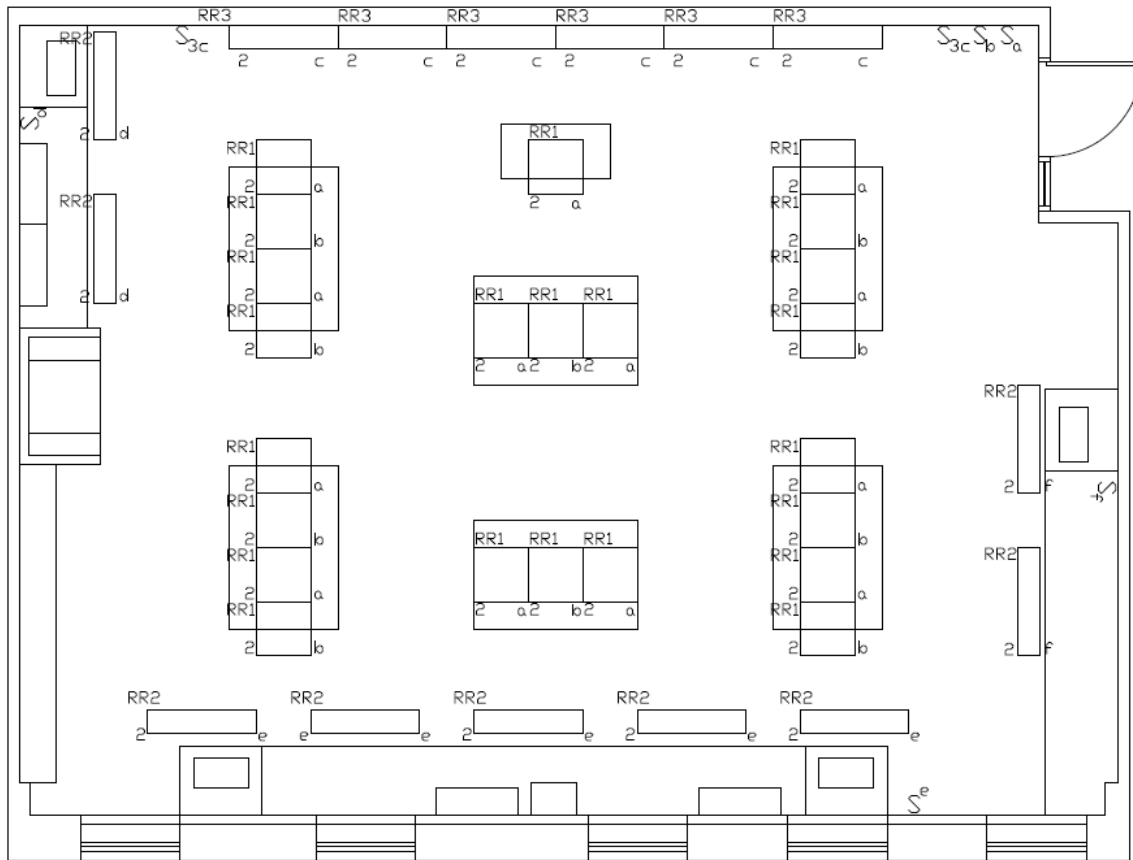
Lighting Plan – Ecology Teaching Lab
